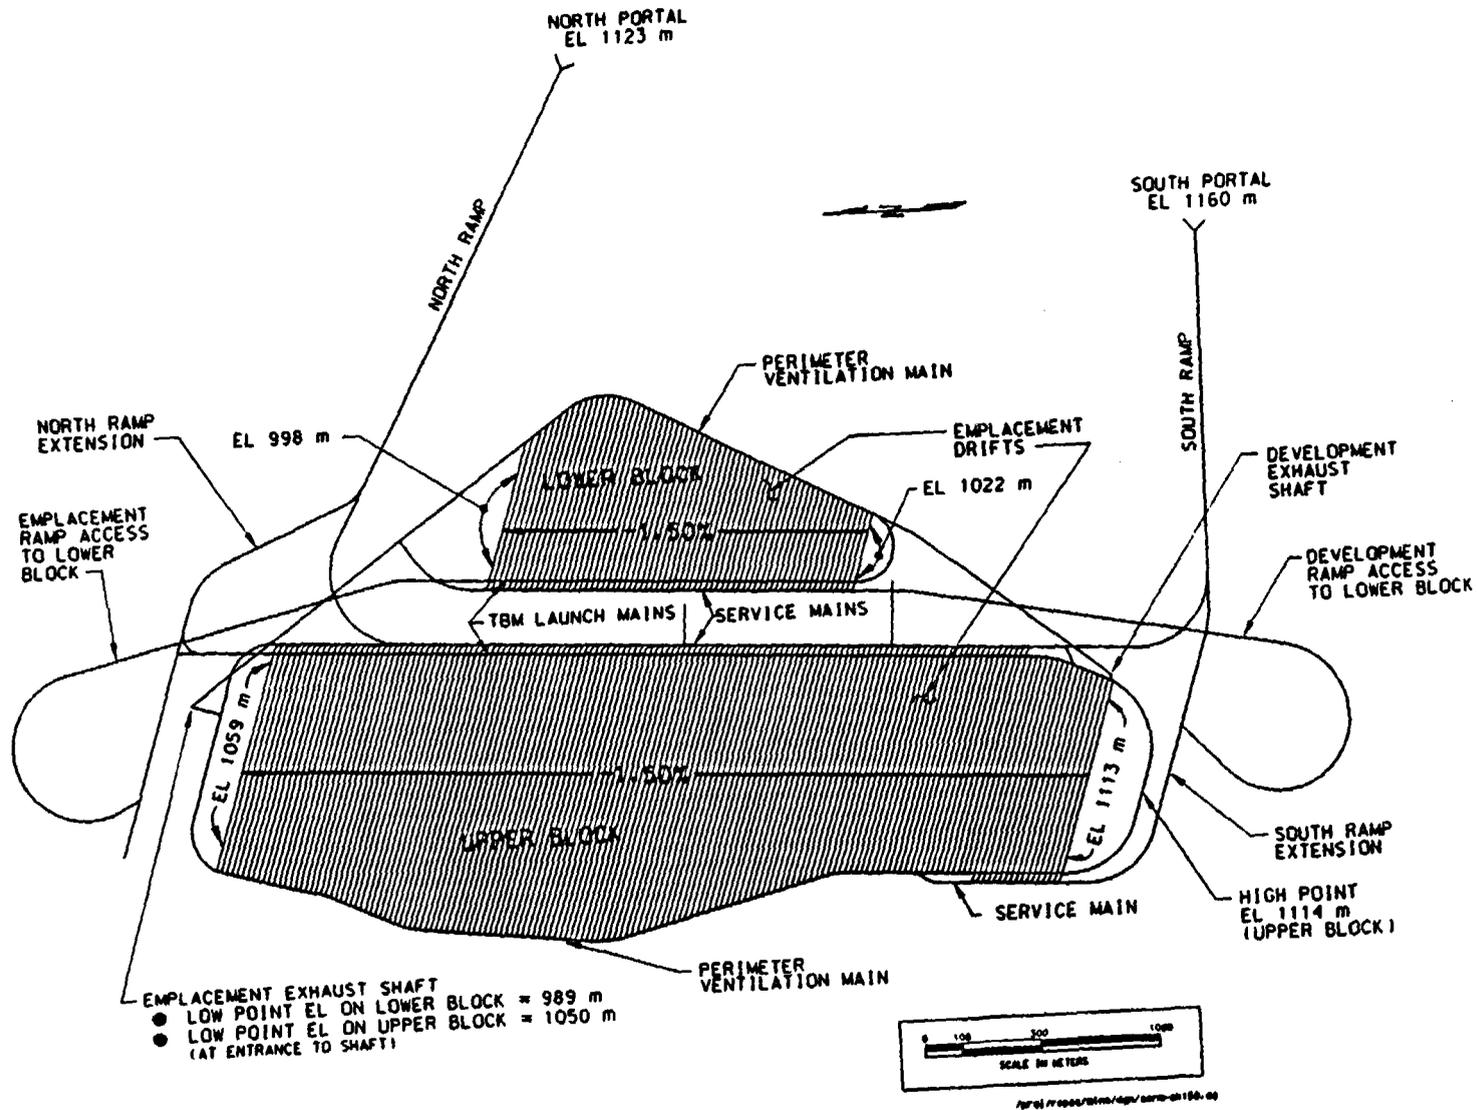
Elevation and Grade Data-Interim Layout
